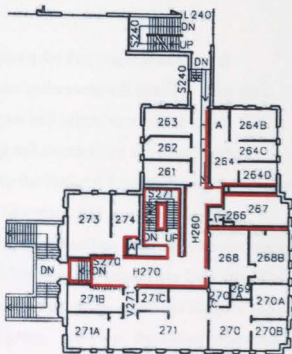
SECOND FLOOR COMMERCE HALL.
